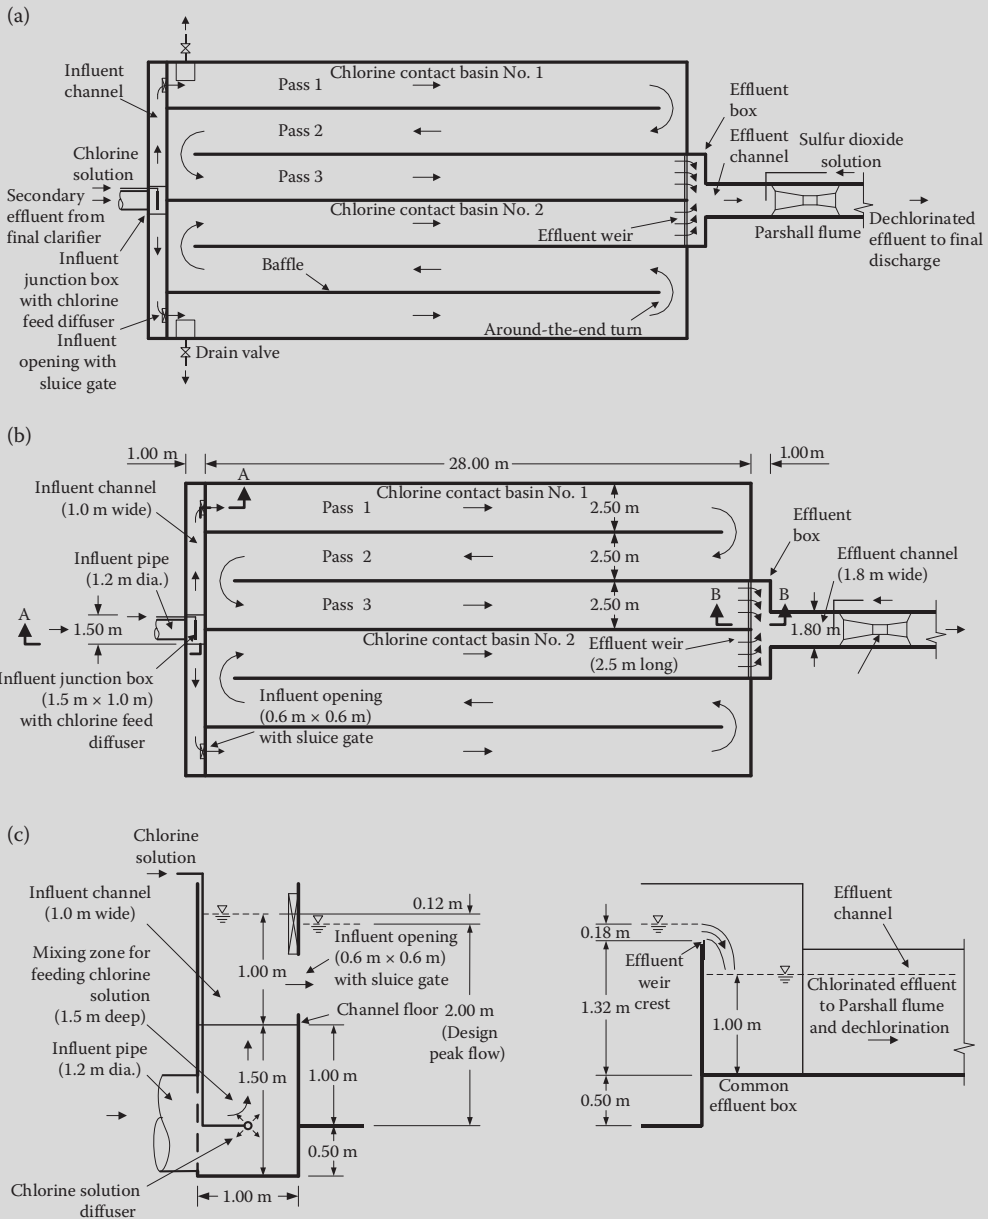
Design details of chlorine contact basins: (a) conceptual layout, (b) plan, (c) Section AA, and (d) Section BB (Example 11.31).
